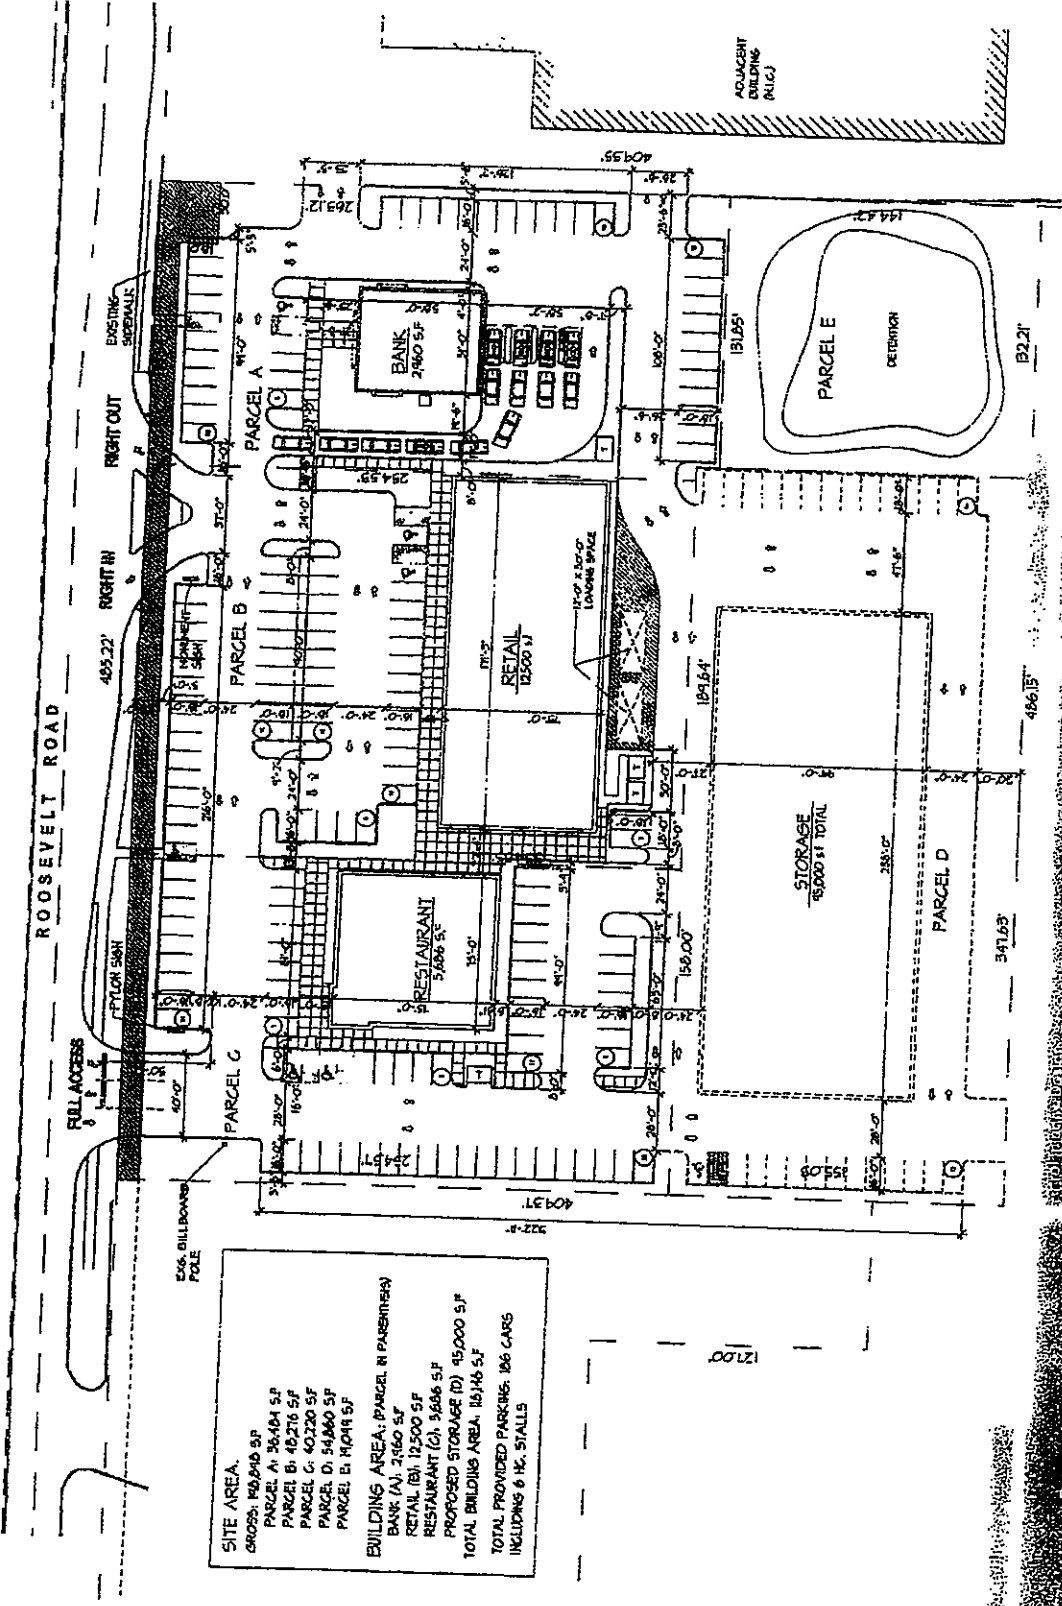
EXHIBIT I: PREVIOUSLY APPROVED PLANS
